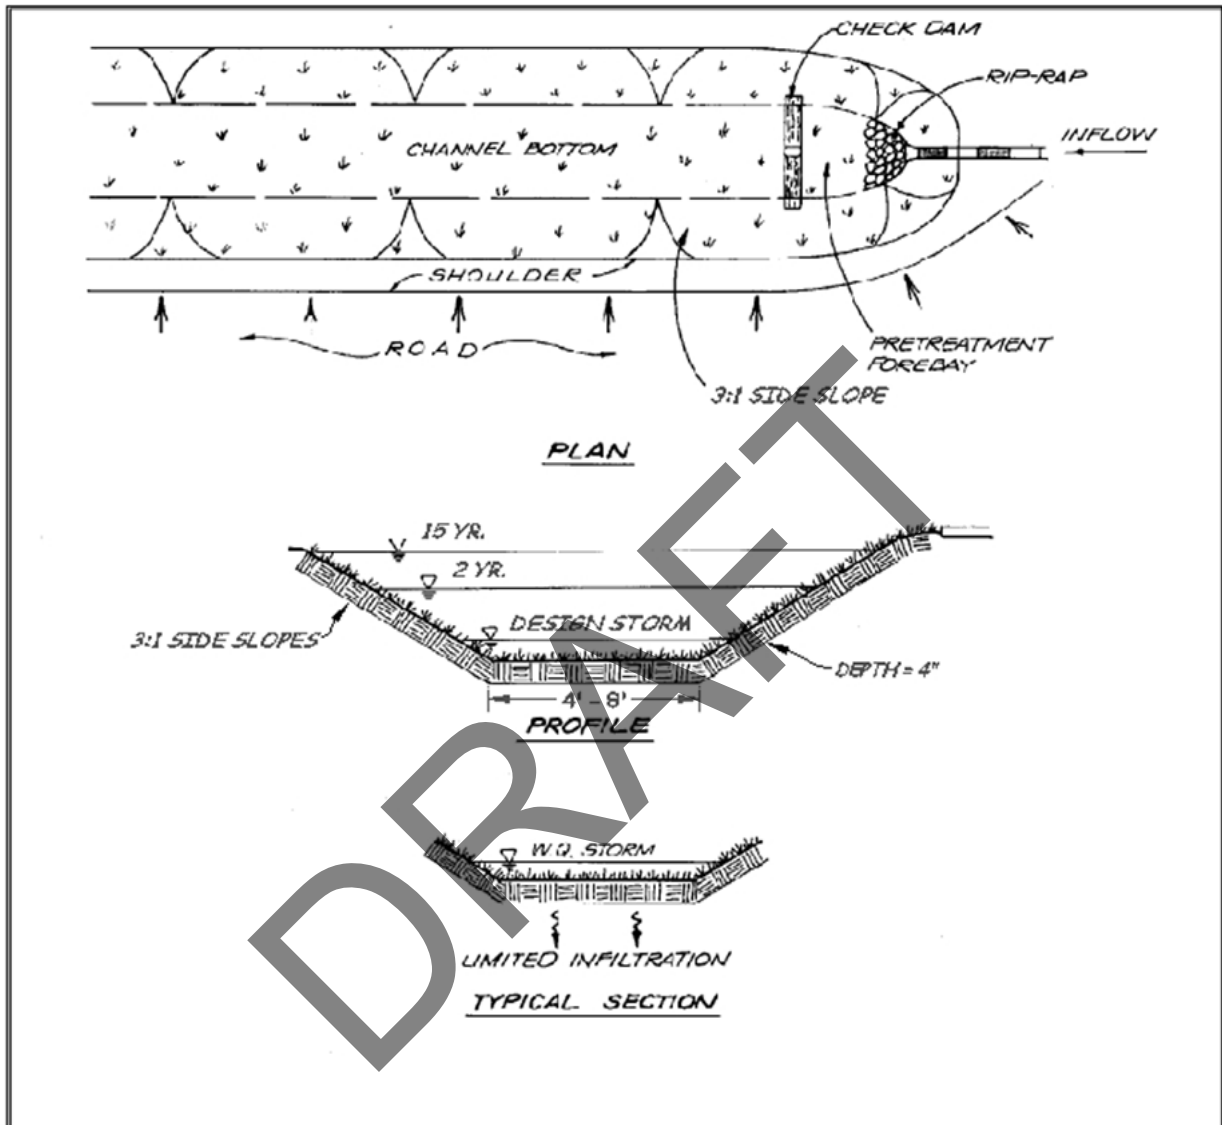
Grass channel typical plan, profile, and section views (O-1).
